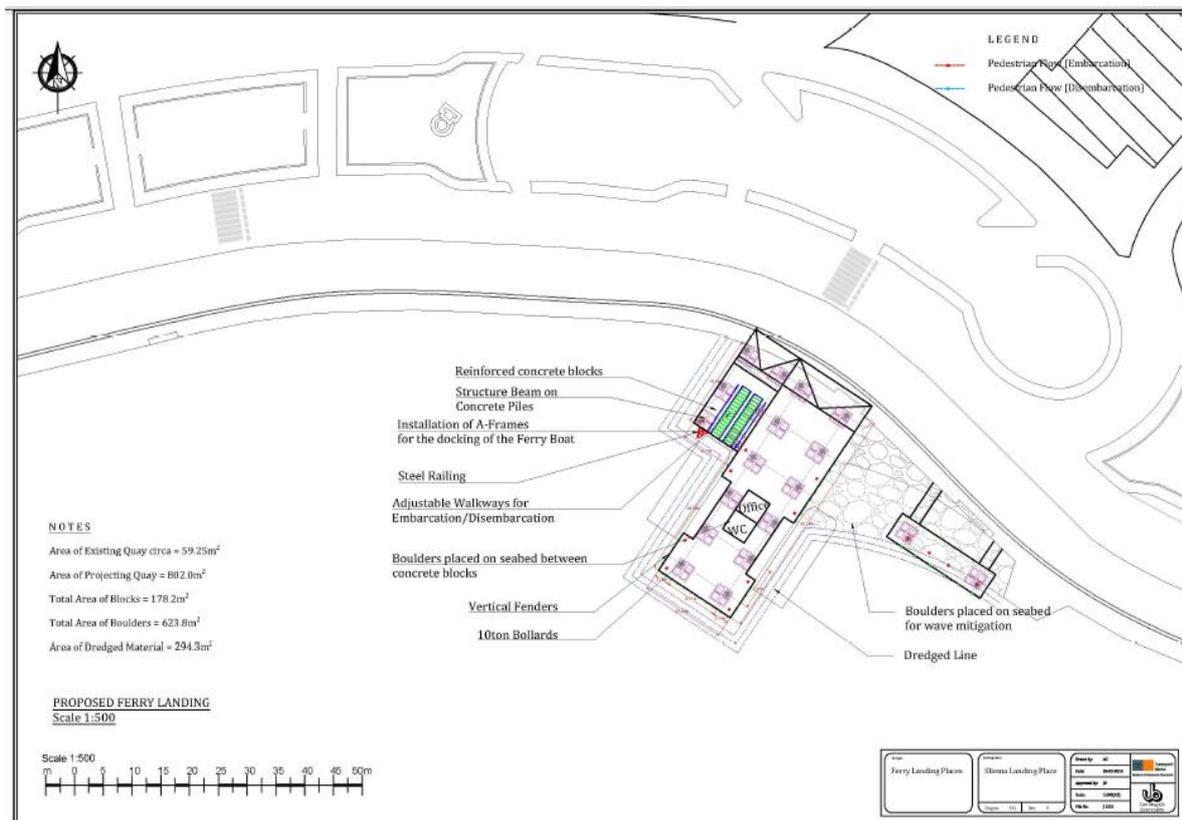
Site plan for the underdeck structure of the proposed development (Source: PDS pg 21)
